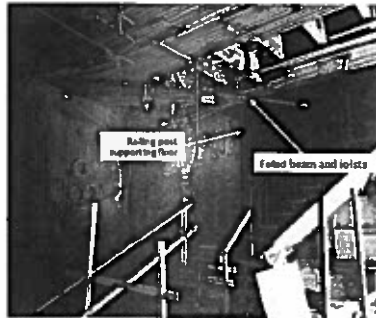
Failed beam and post of 2nd floor stair opening and railing post supporting portion of 2nd floor
